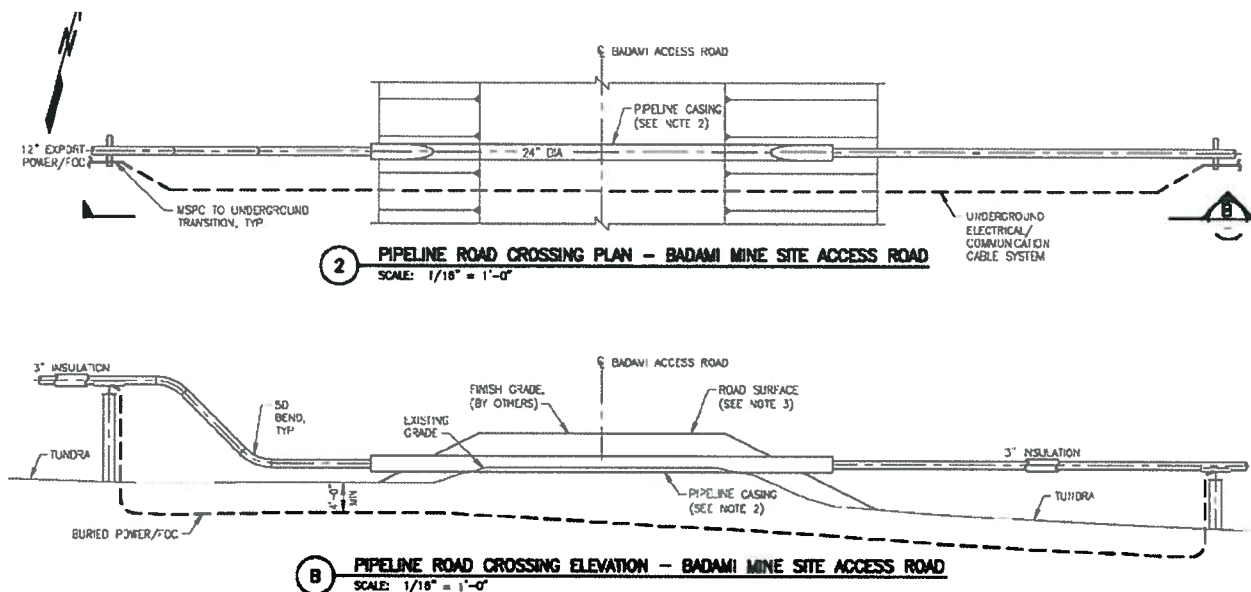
Badami Mine Site Access Road Crossing Elevation and Section
